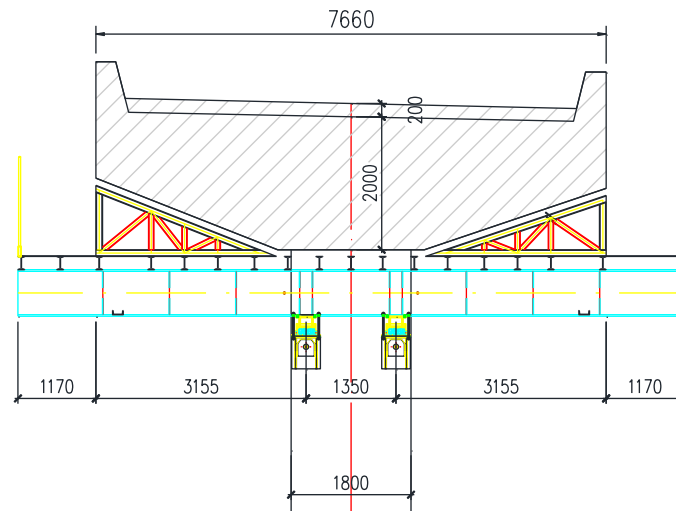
Ground-free support for a bent cap in the Jiulong Avenue project (unit: mm)
